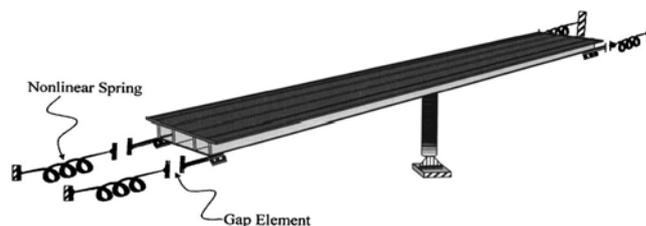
Two-span 3D Bridge Structural Model Considering Gapping Effects [1]
